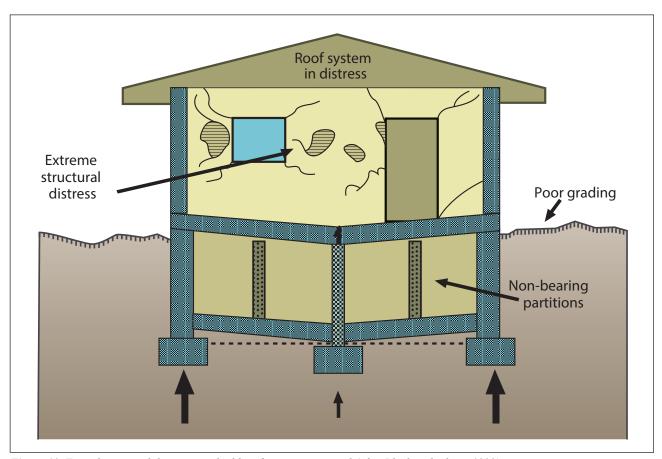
Typical structural damage to a building from expansive soil (after Black and others, 1999).
